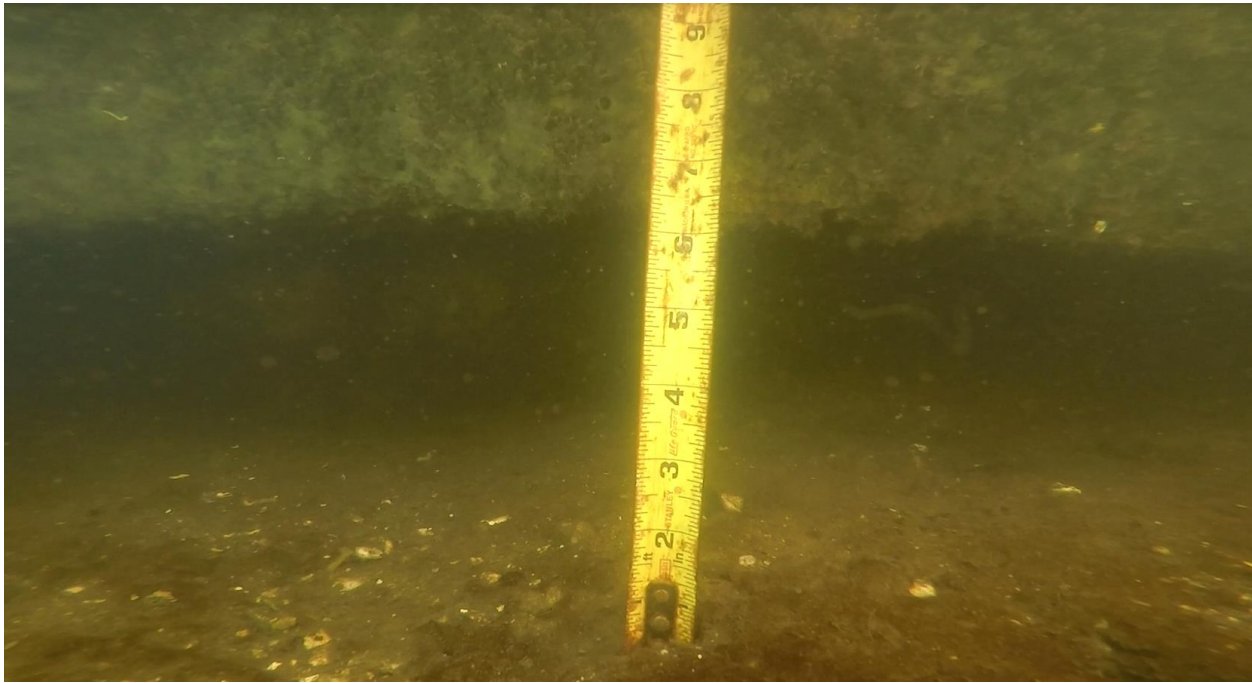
Sta 8+00 looking south. View of backfill close to the bulkhead cap elevation.
